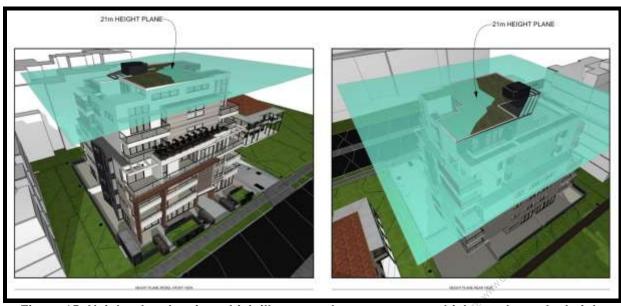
Height plan drawing which illustrates the components which are above the height control (Source: Tecton Group Architecture).
